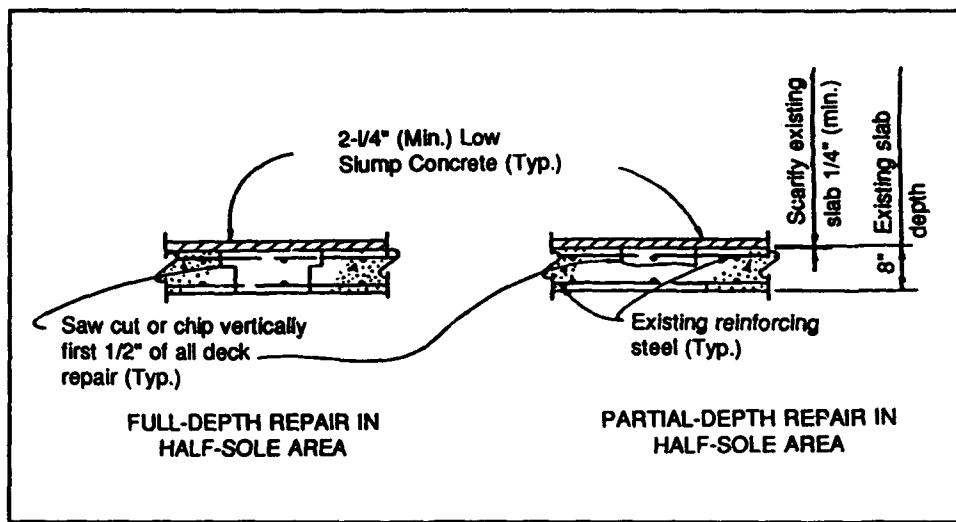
Roadway patching details, Tuttle Creek Dam Spillway Bridge, 1987
